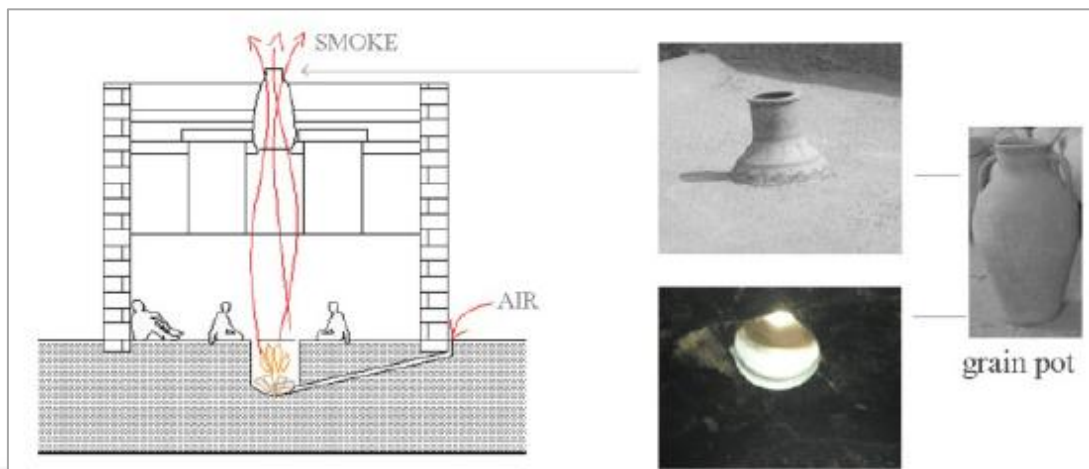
Chimney detail of masonry building and used grain pot in Cappadocia-Turkey (Ozata S., 2015)
